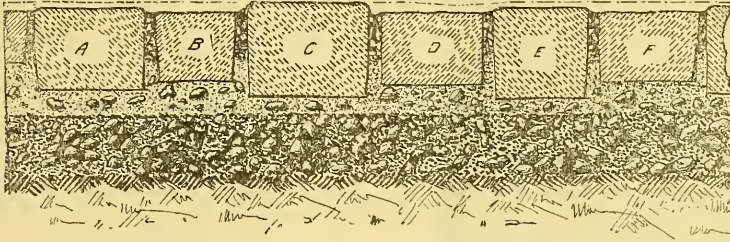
PAVEMENT AFTER HEAVY TRAFFIC.
